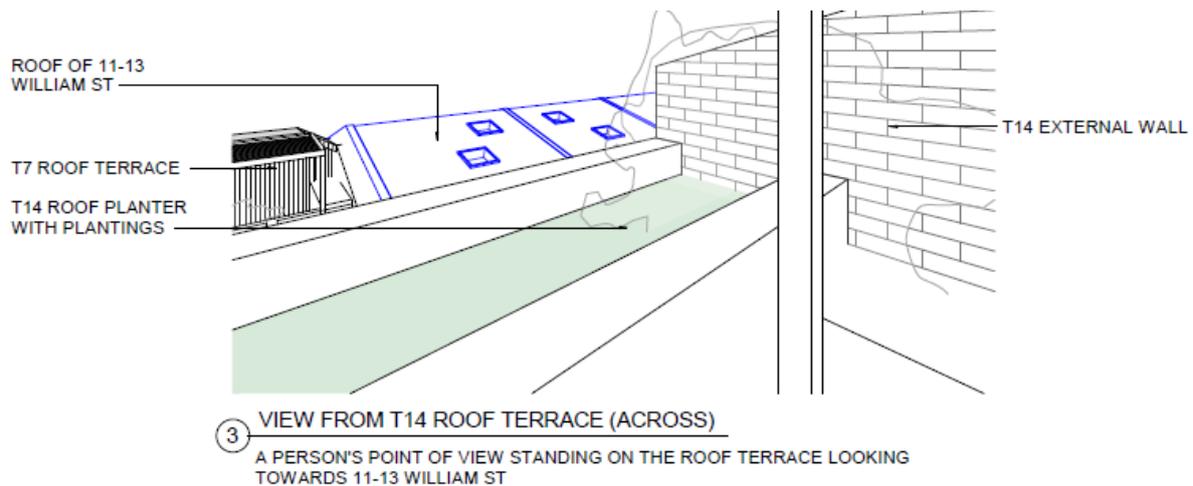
Planter boxes at the roof level have a depth of 1.1m and successfully mitigate downwards overlooking towards dwellings at the northern boundary (11-13 William Street)
